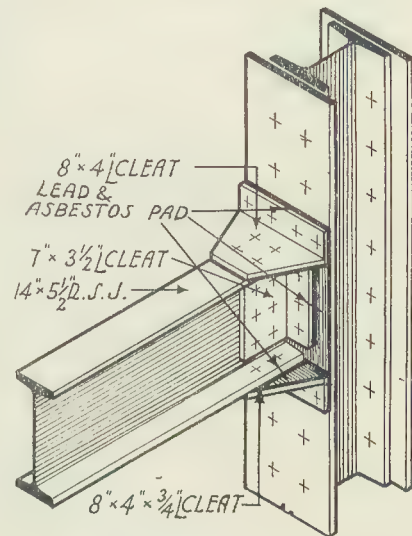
INSULATION OF STRUCTURAL MEMBERS
